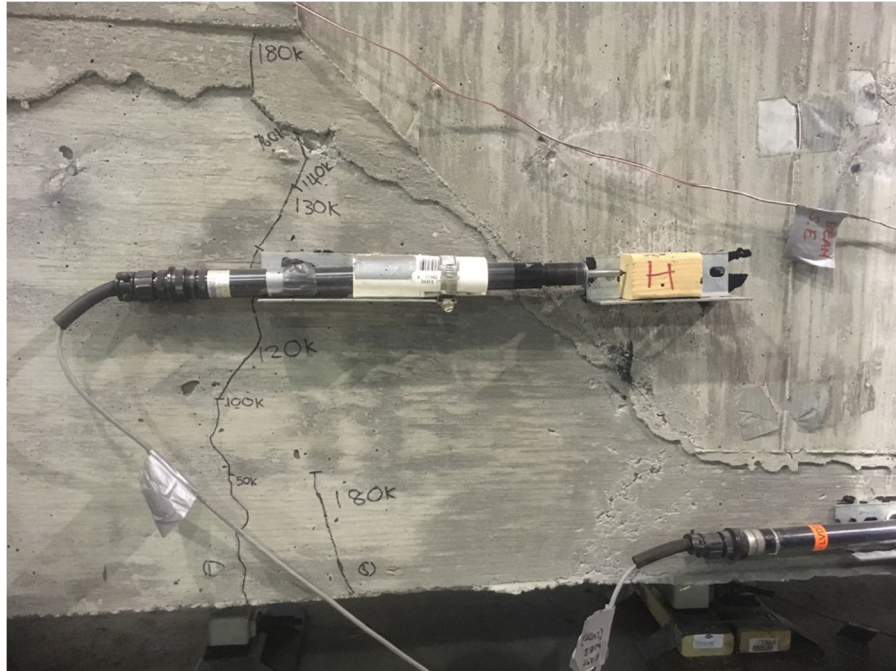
Welded connection failure test - crack propagation and new crack location at 180 kips
